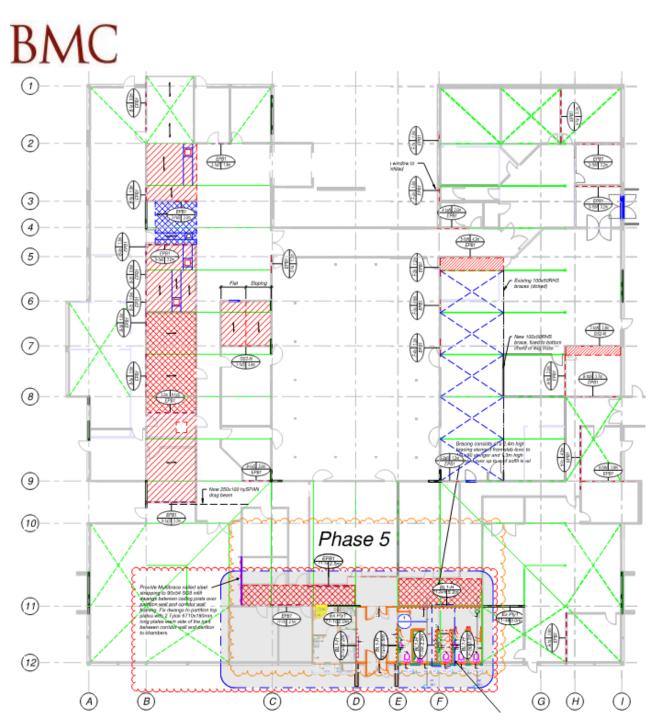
Plan view of William Fraser Block showing Existing Structure, Bracing walls and new alteration provisions.
